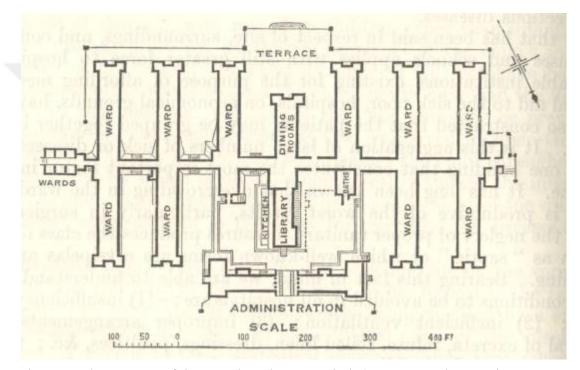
Plan Layout of the Royal Herbert Hospital. (Source: Asylum Projects, 2013)
